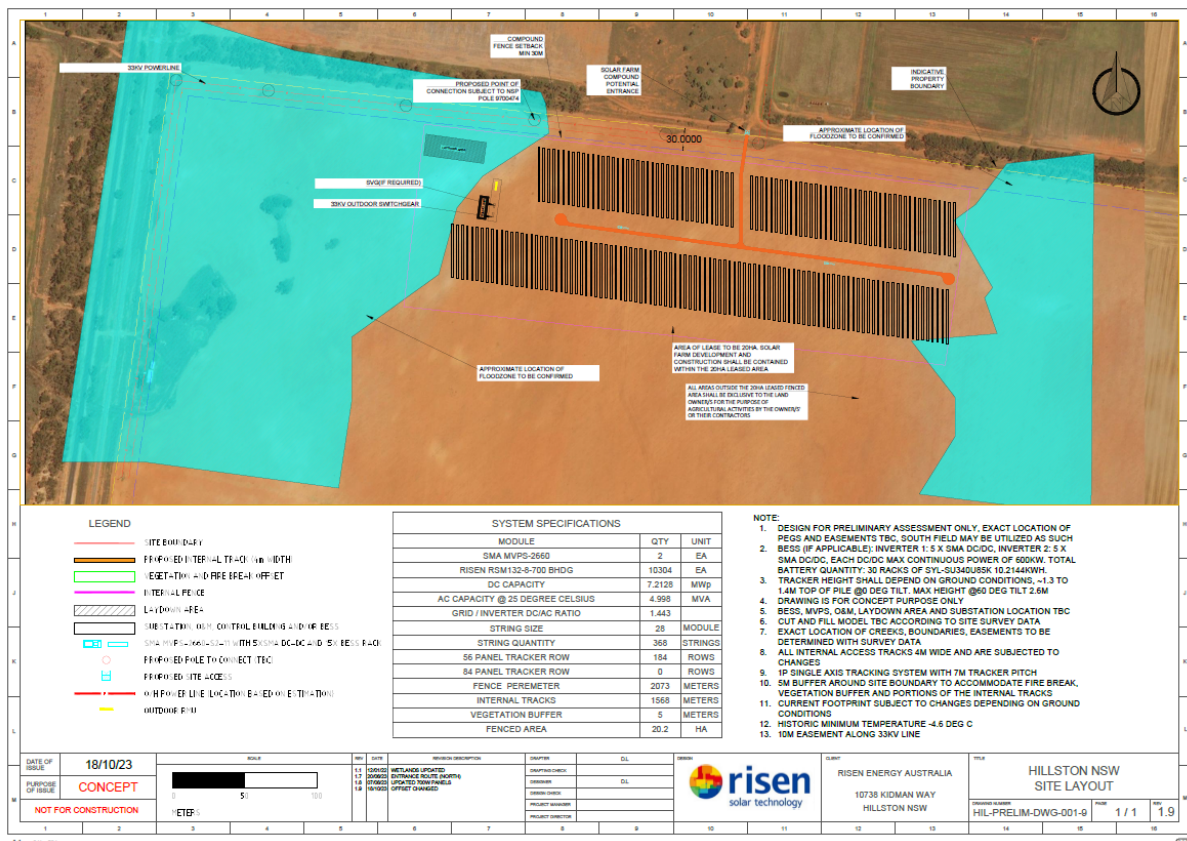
Development layout - Site context plan- access from Norwood Lane (Source: Risen Energy Australia, 2023) .
